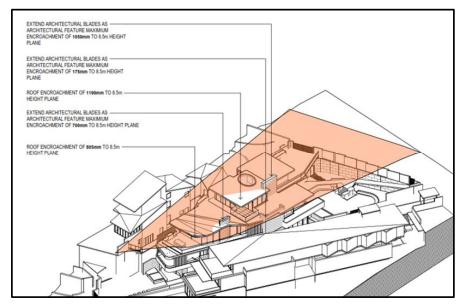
Extract of height plane diagram – showing one corner of the upper-level terrace exceeding the 8.5m height control (the blade wall are architectural features only)
